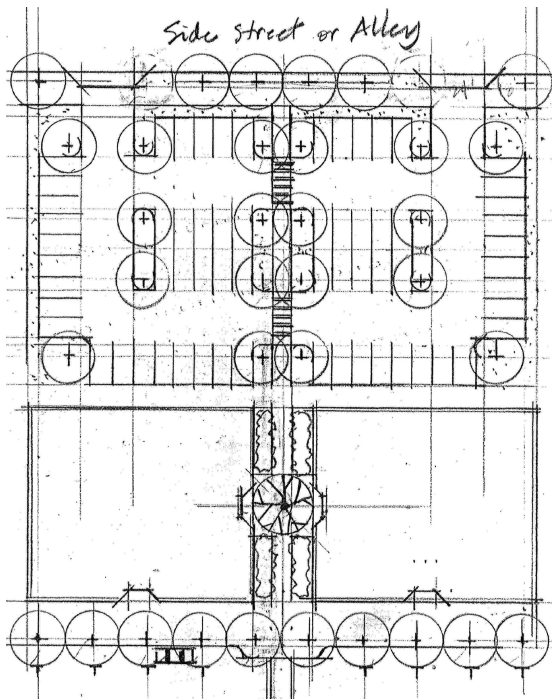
Parking at Rear with Paseo: To maintain a continuous active street frontage, parking should be located to the rear of buildings and be accessed from a side street or alley. Pedestrian paseos with active uses and attractive landscaping should link parking with the street frontage.
